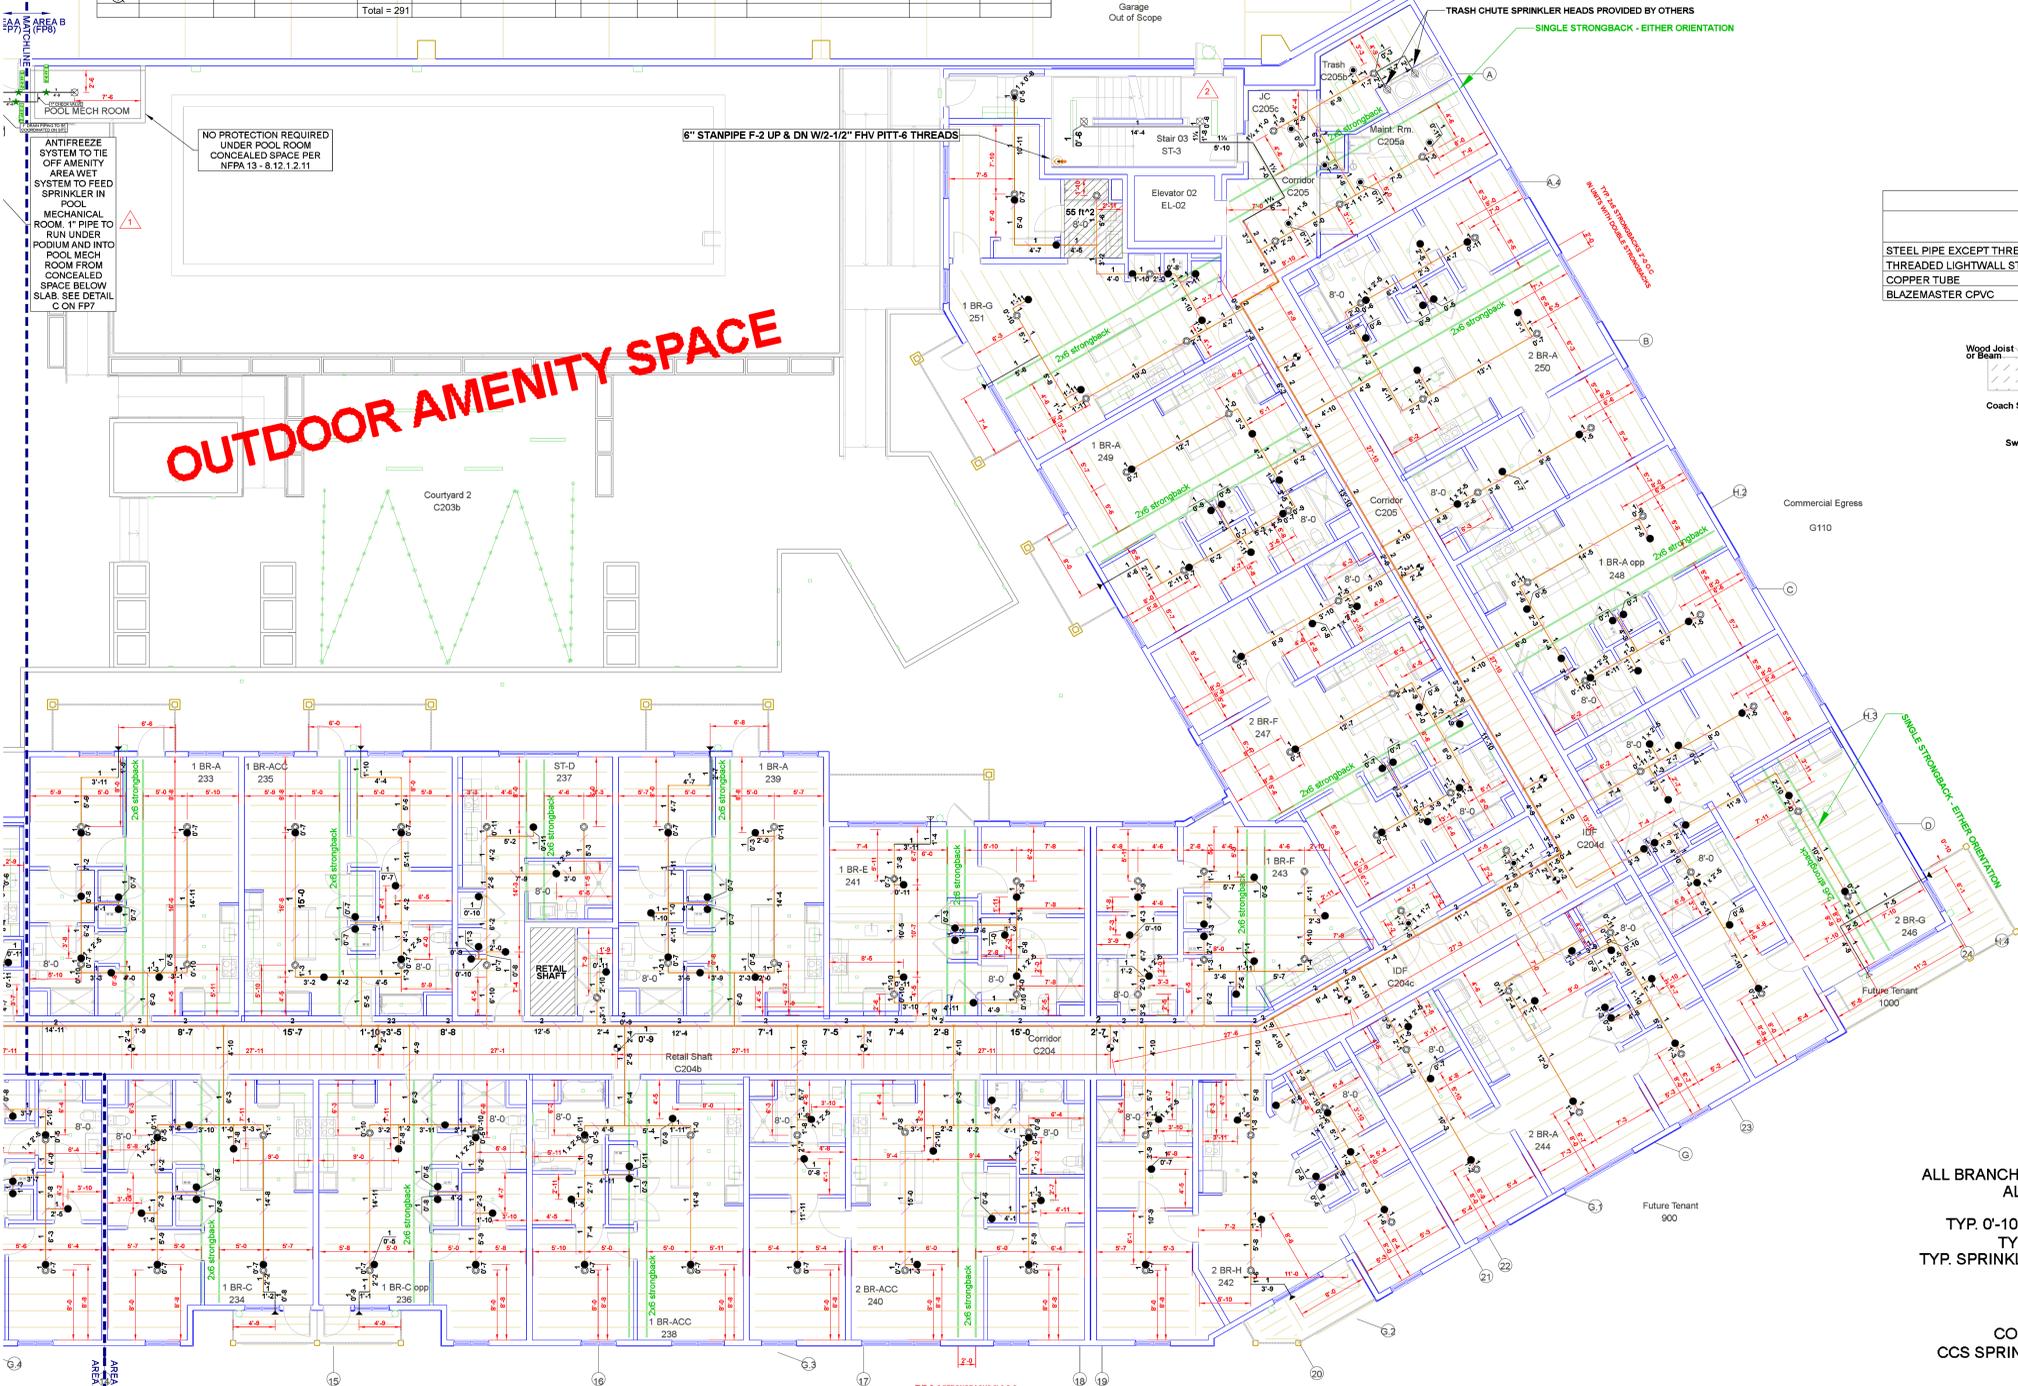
DETAIL B - CORRIDOR DESIGN AND COORDINATION
